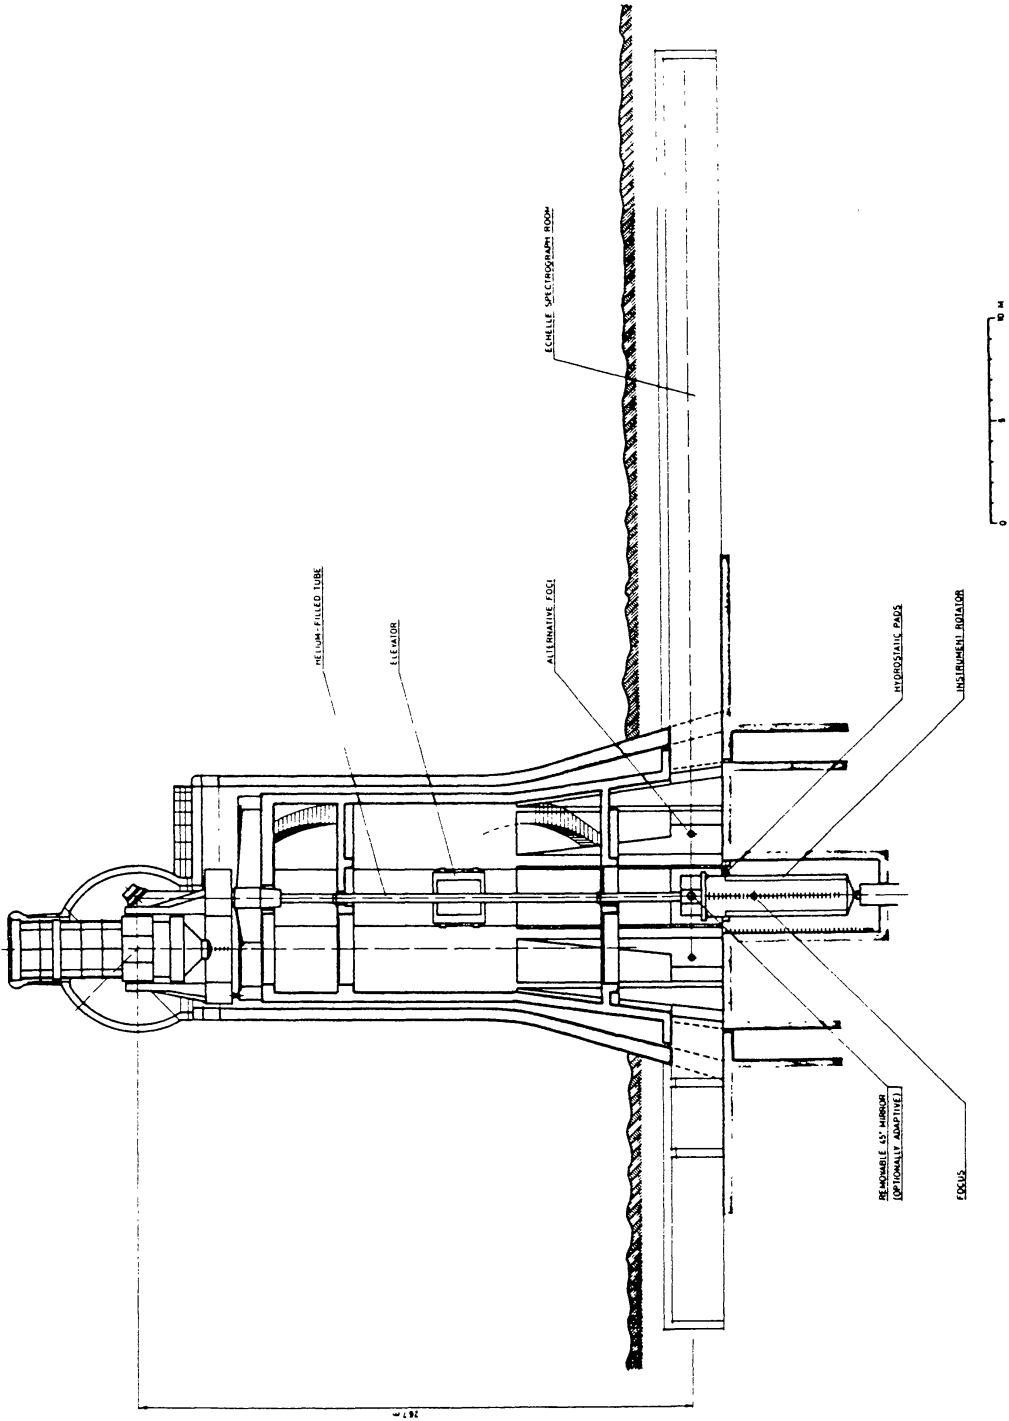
/2 - Vertical cross-section through the LEST tower and telescope.
